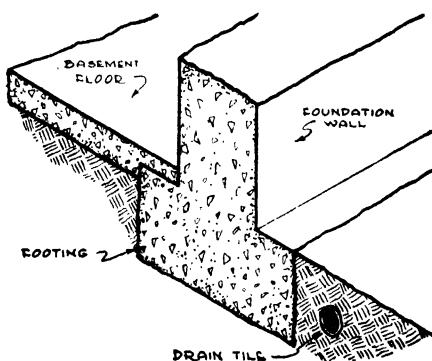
Detail of Foundation Wall Showing Footing Properly Constructed
